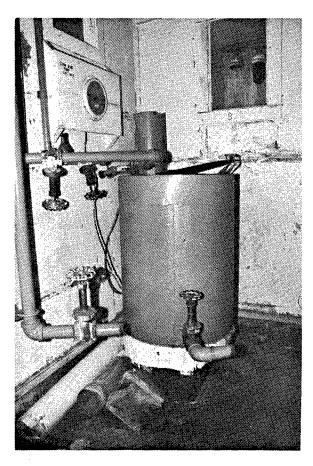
Building 6657-2: Steel air receiver tank and horizontal graver tank manufactured in 1942.
